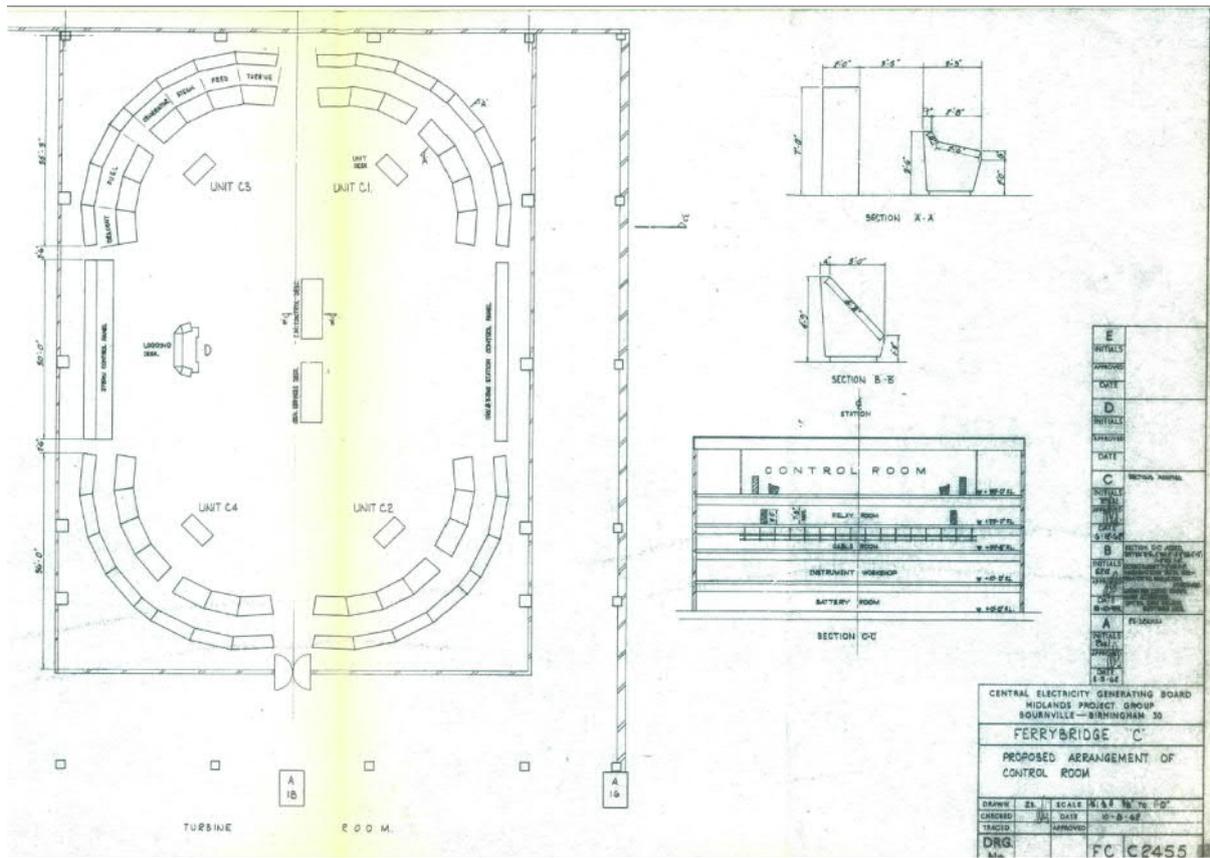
The original 1968 Outline Design plans of the control room (source: SSE Generation Ltd. Private Archive)
